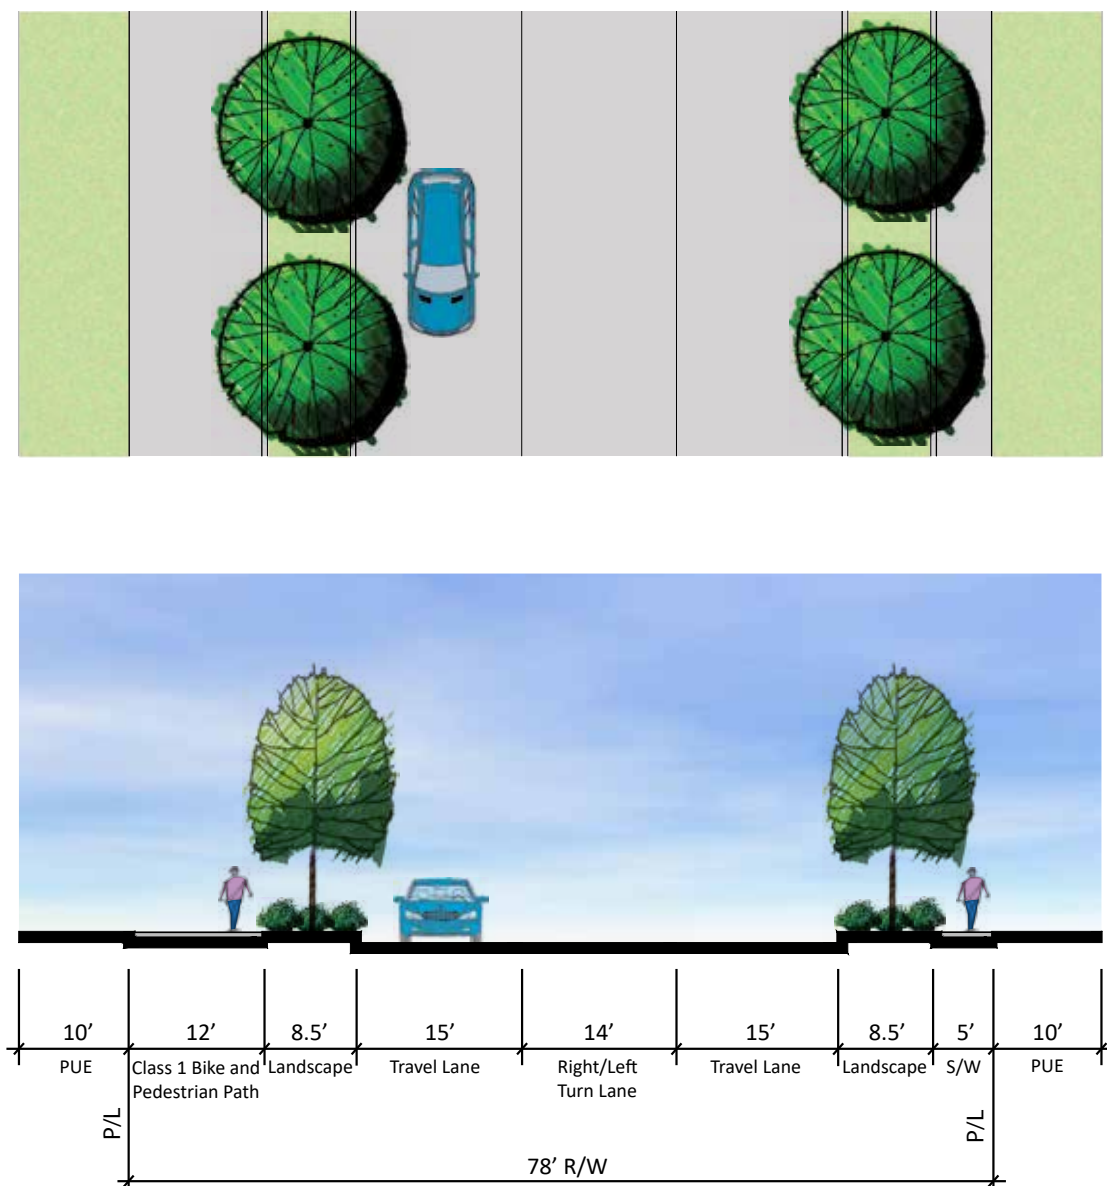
, 2-Lane Local Industrial Street, Section F-F
